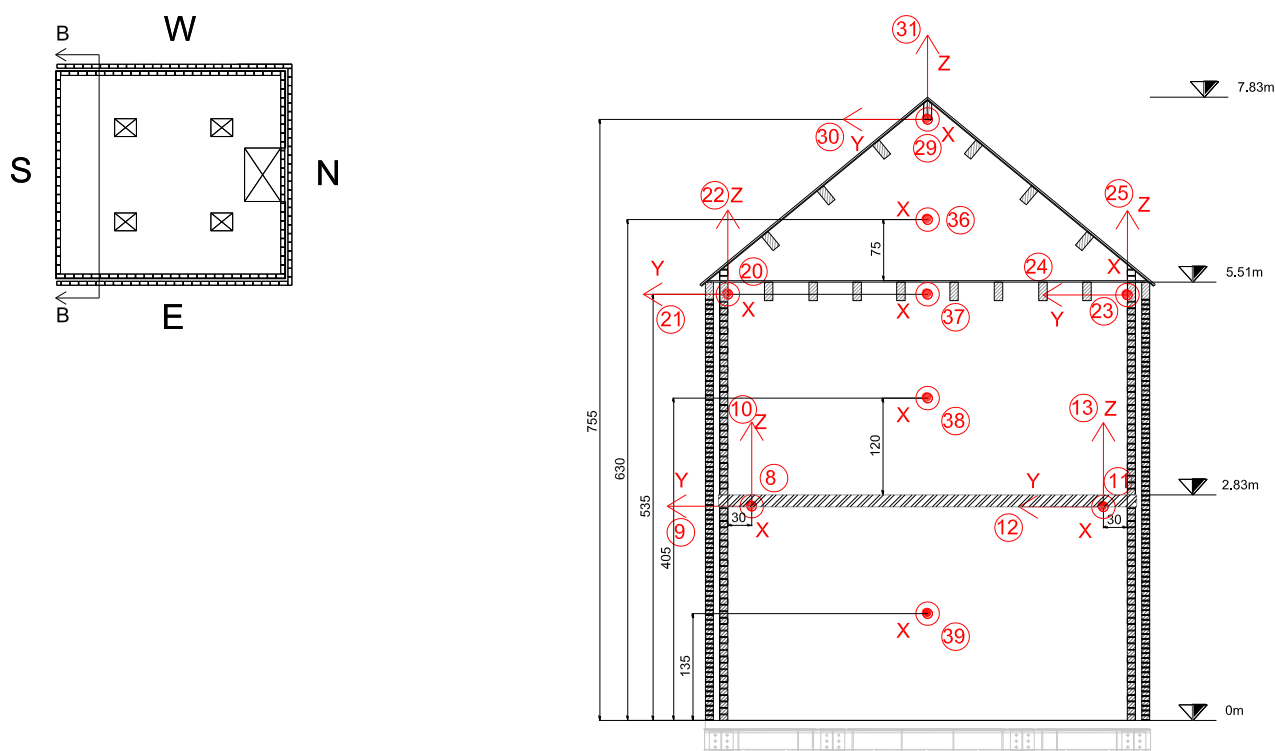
Accelerometer elevation: South calcium silicate inner leaf - Section B-B.
